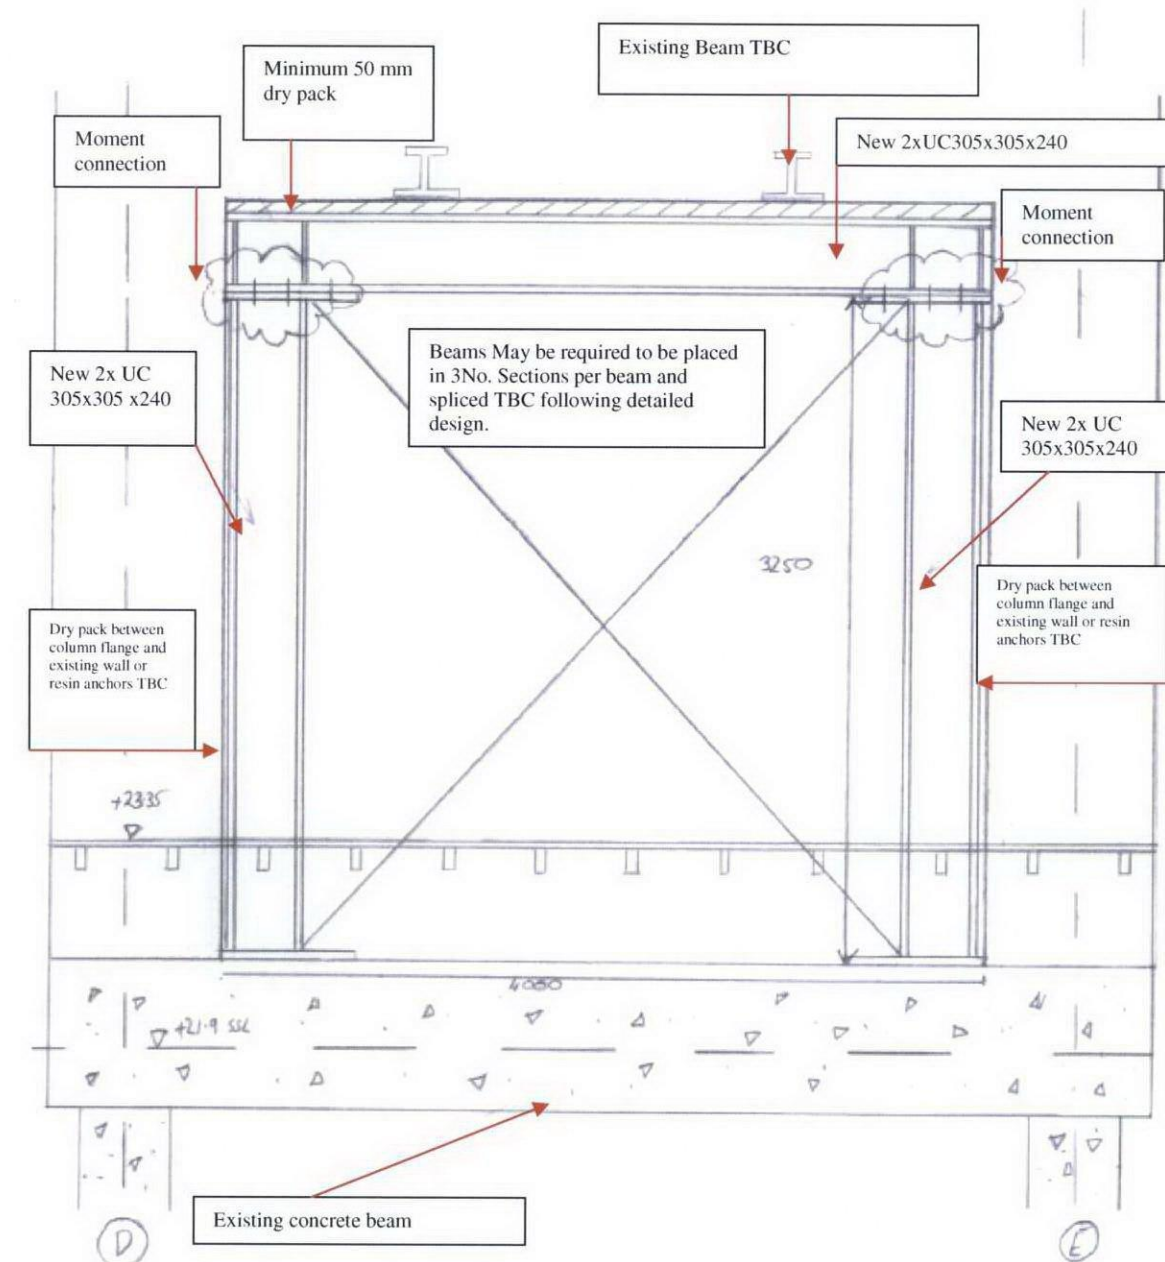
Elevation showing 1st floor Pantry-dining opening (SK051)
